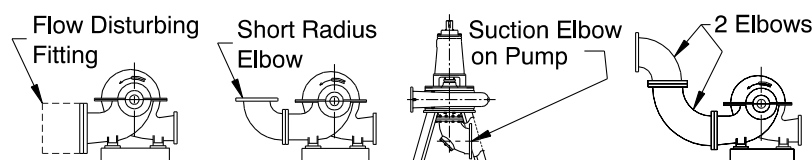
Examples of suction pipe fittings near pump that require approval of the pump manufacturer
